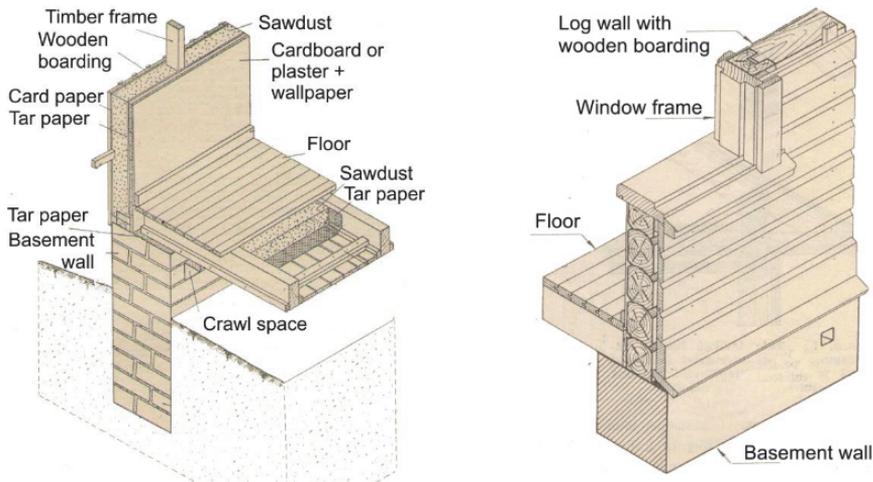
Connections of the exterior wall with floor (left) and window (right) (based on Veski 1943).
